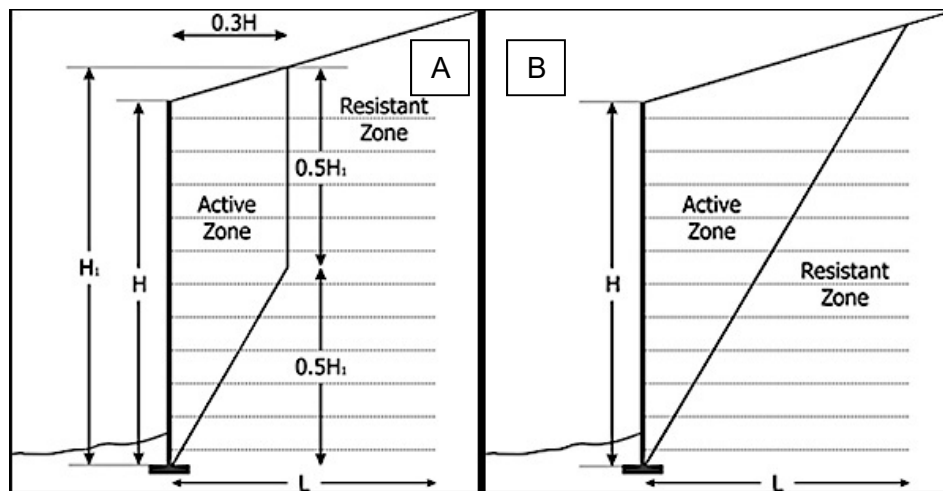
(A) Resistance Zone for Steel Reinforcement (*Inextensible*) (B) Resistance Zone for Geosynthetic Reinforcement (*Extensible*)
